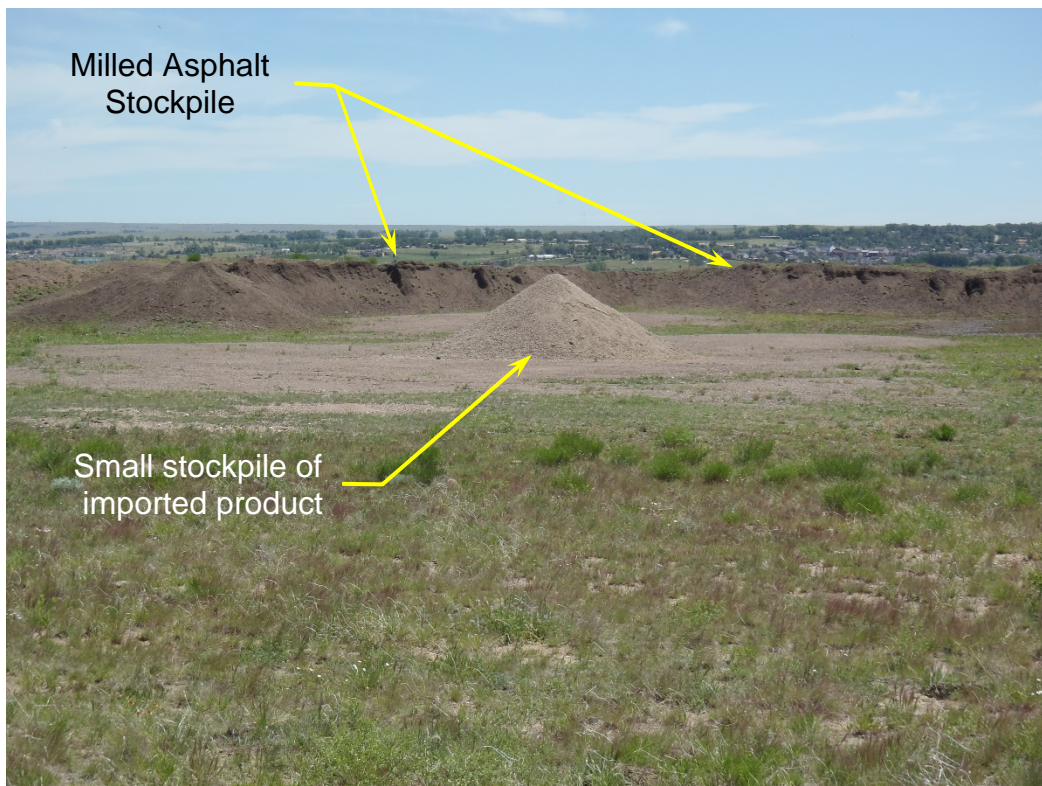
Milled asphalt stockpile (Looking NE from paved access road).
